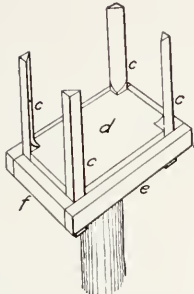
Floor and posts added to foundation shown in figure 13.
